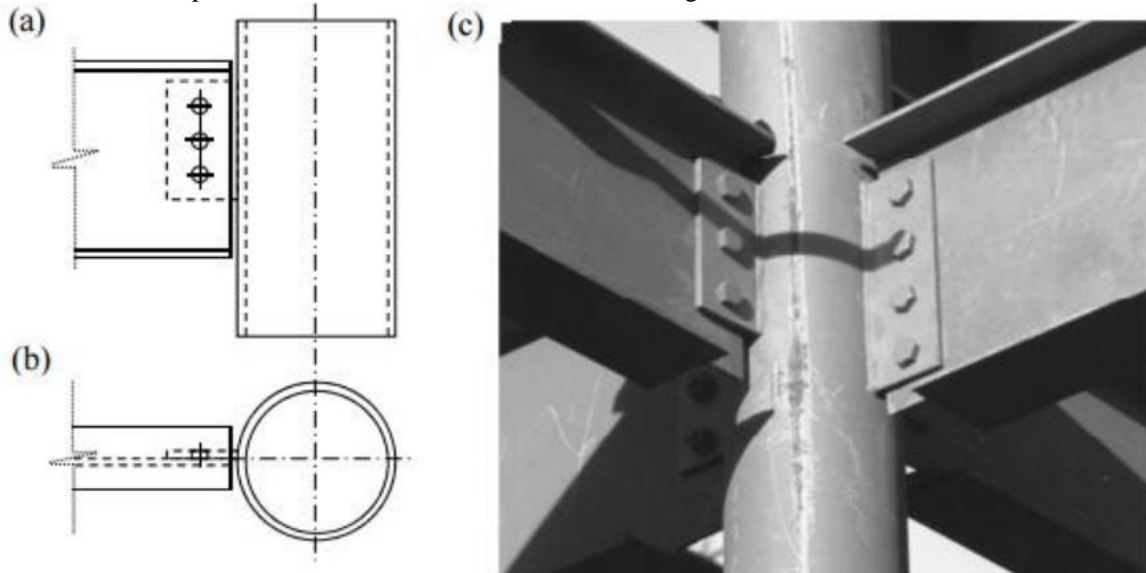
Single shear fin plate connection to circular hollow section view (a) Elevation view (b) Section view (c) 3D view of actual construction .
